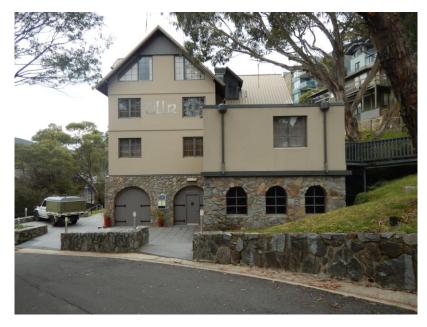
Photo of the western elevation of the building from Mowamba Place and the existing Eucalypt recommended to be trimmed
